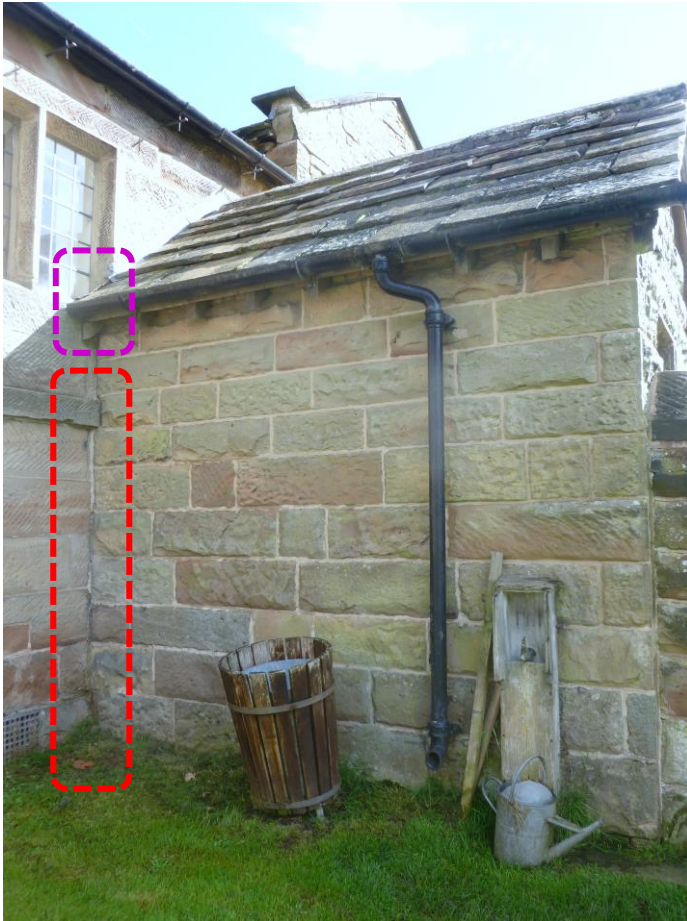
Fuel Store Block, Roof clashes with the Hall's window inside the purple colour area. Also, poor mortar joint detail, see figure 14.
